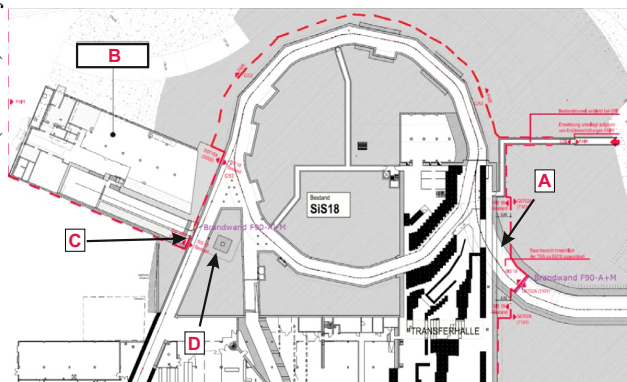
Layout of the present SIS18 building with GAF and WTK extension. The extraction towards FAIR is done into tunnel 101 at Point A. The pLINAC Building is shown at point B. The proton injection of from the new pLINAC is done into the transfer channel at C. The pLINAC beam dump has been cast at position D.
